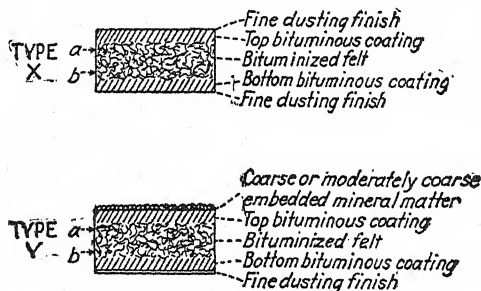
Types of Asphalt Roll-roofings and Shingles.
